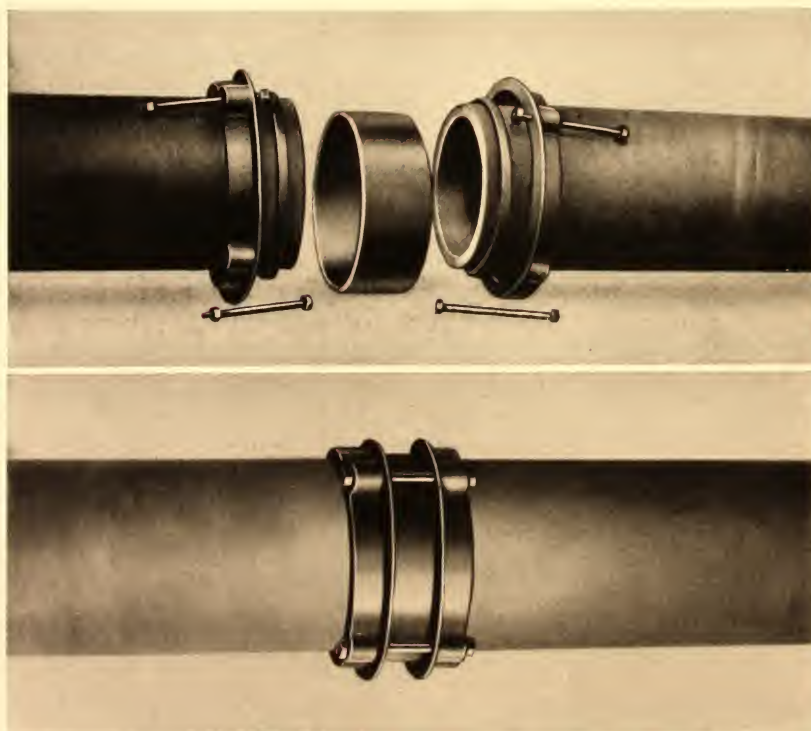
THE GIBALT JOINT BEFORE AND AFTER ASSEMBLY.
